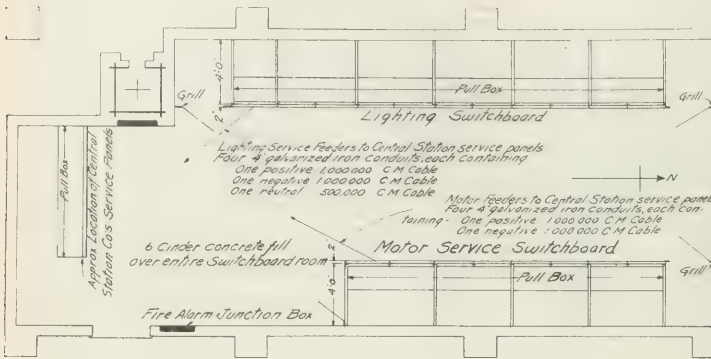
PLAN OF SWITCHBOARD ROOM IN BASEMENT
